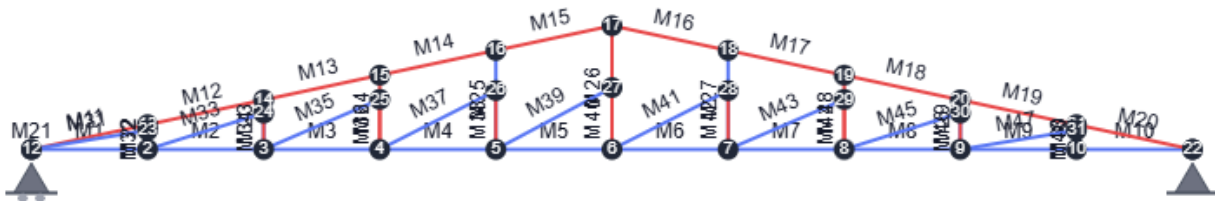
Scissor truss for the conventional construction 50 mm x 50 mm rectangular steel
